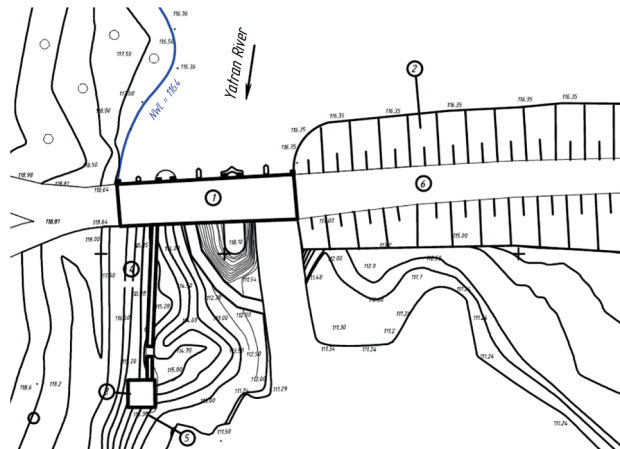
Scheme of Perehonivka mini hydropower plant: 1 – water spillway, 2 – earth dam, 3 – power house, 4 – inlet canal, 5 – outlet canal, 6 – road.
